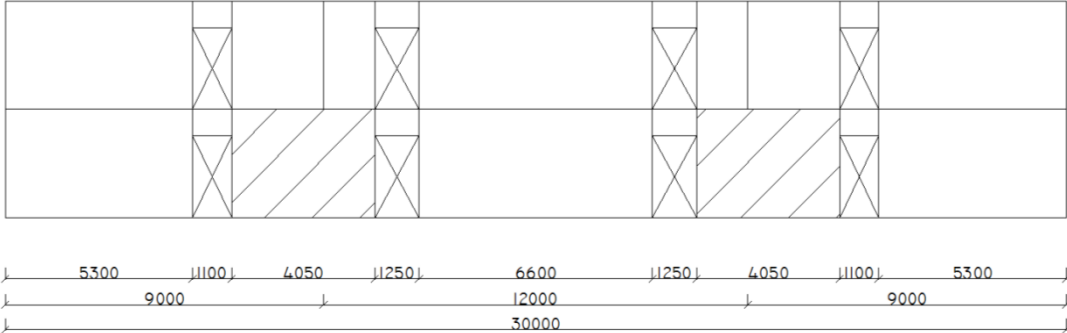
Restricted areas due to overlap at wall 1, 2 and 3
